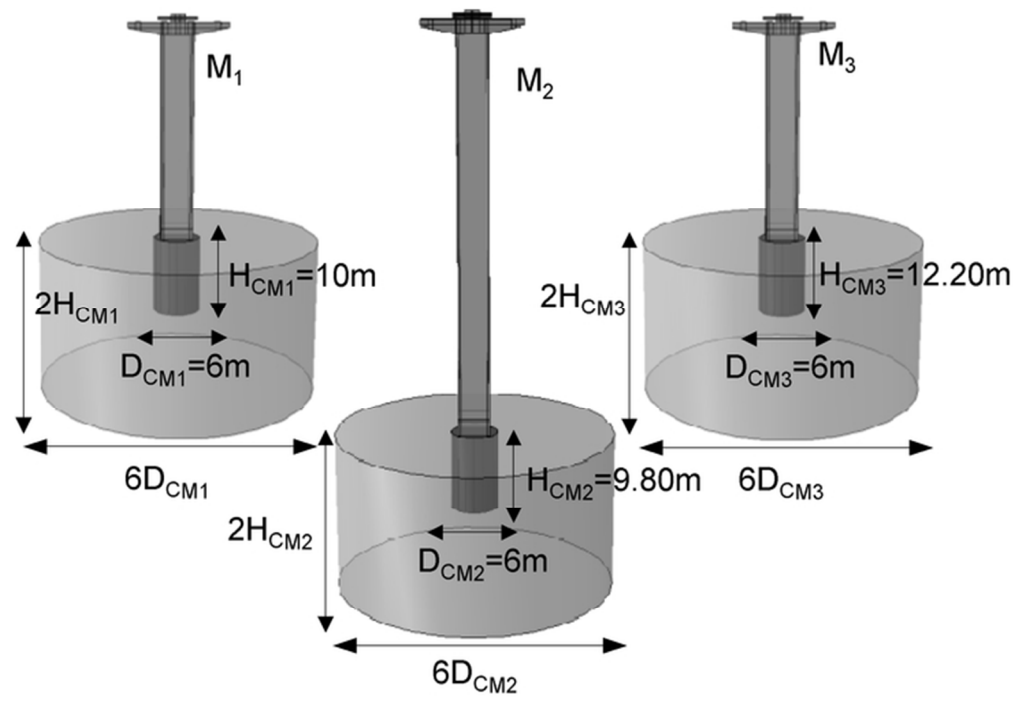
Modelling details of the embedded caisson foundations of piers M1, M2 and M3.
